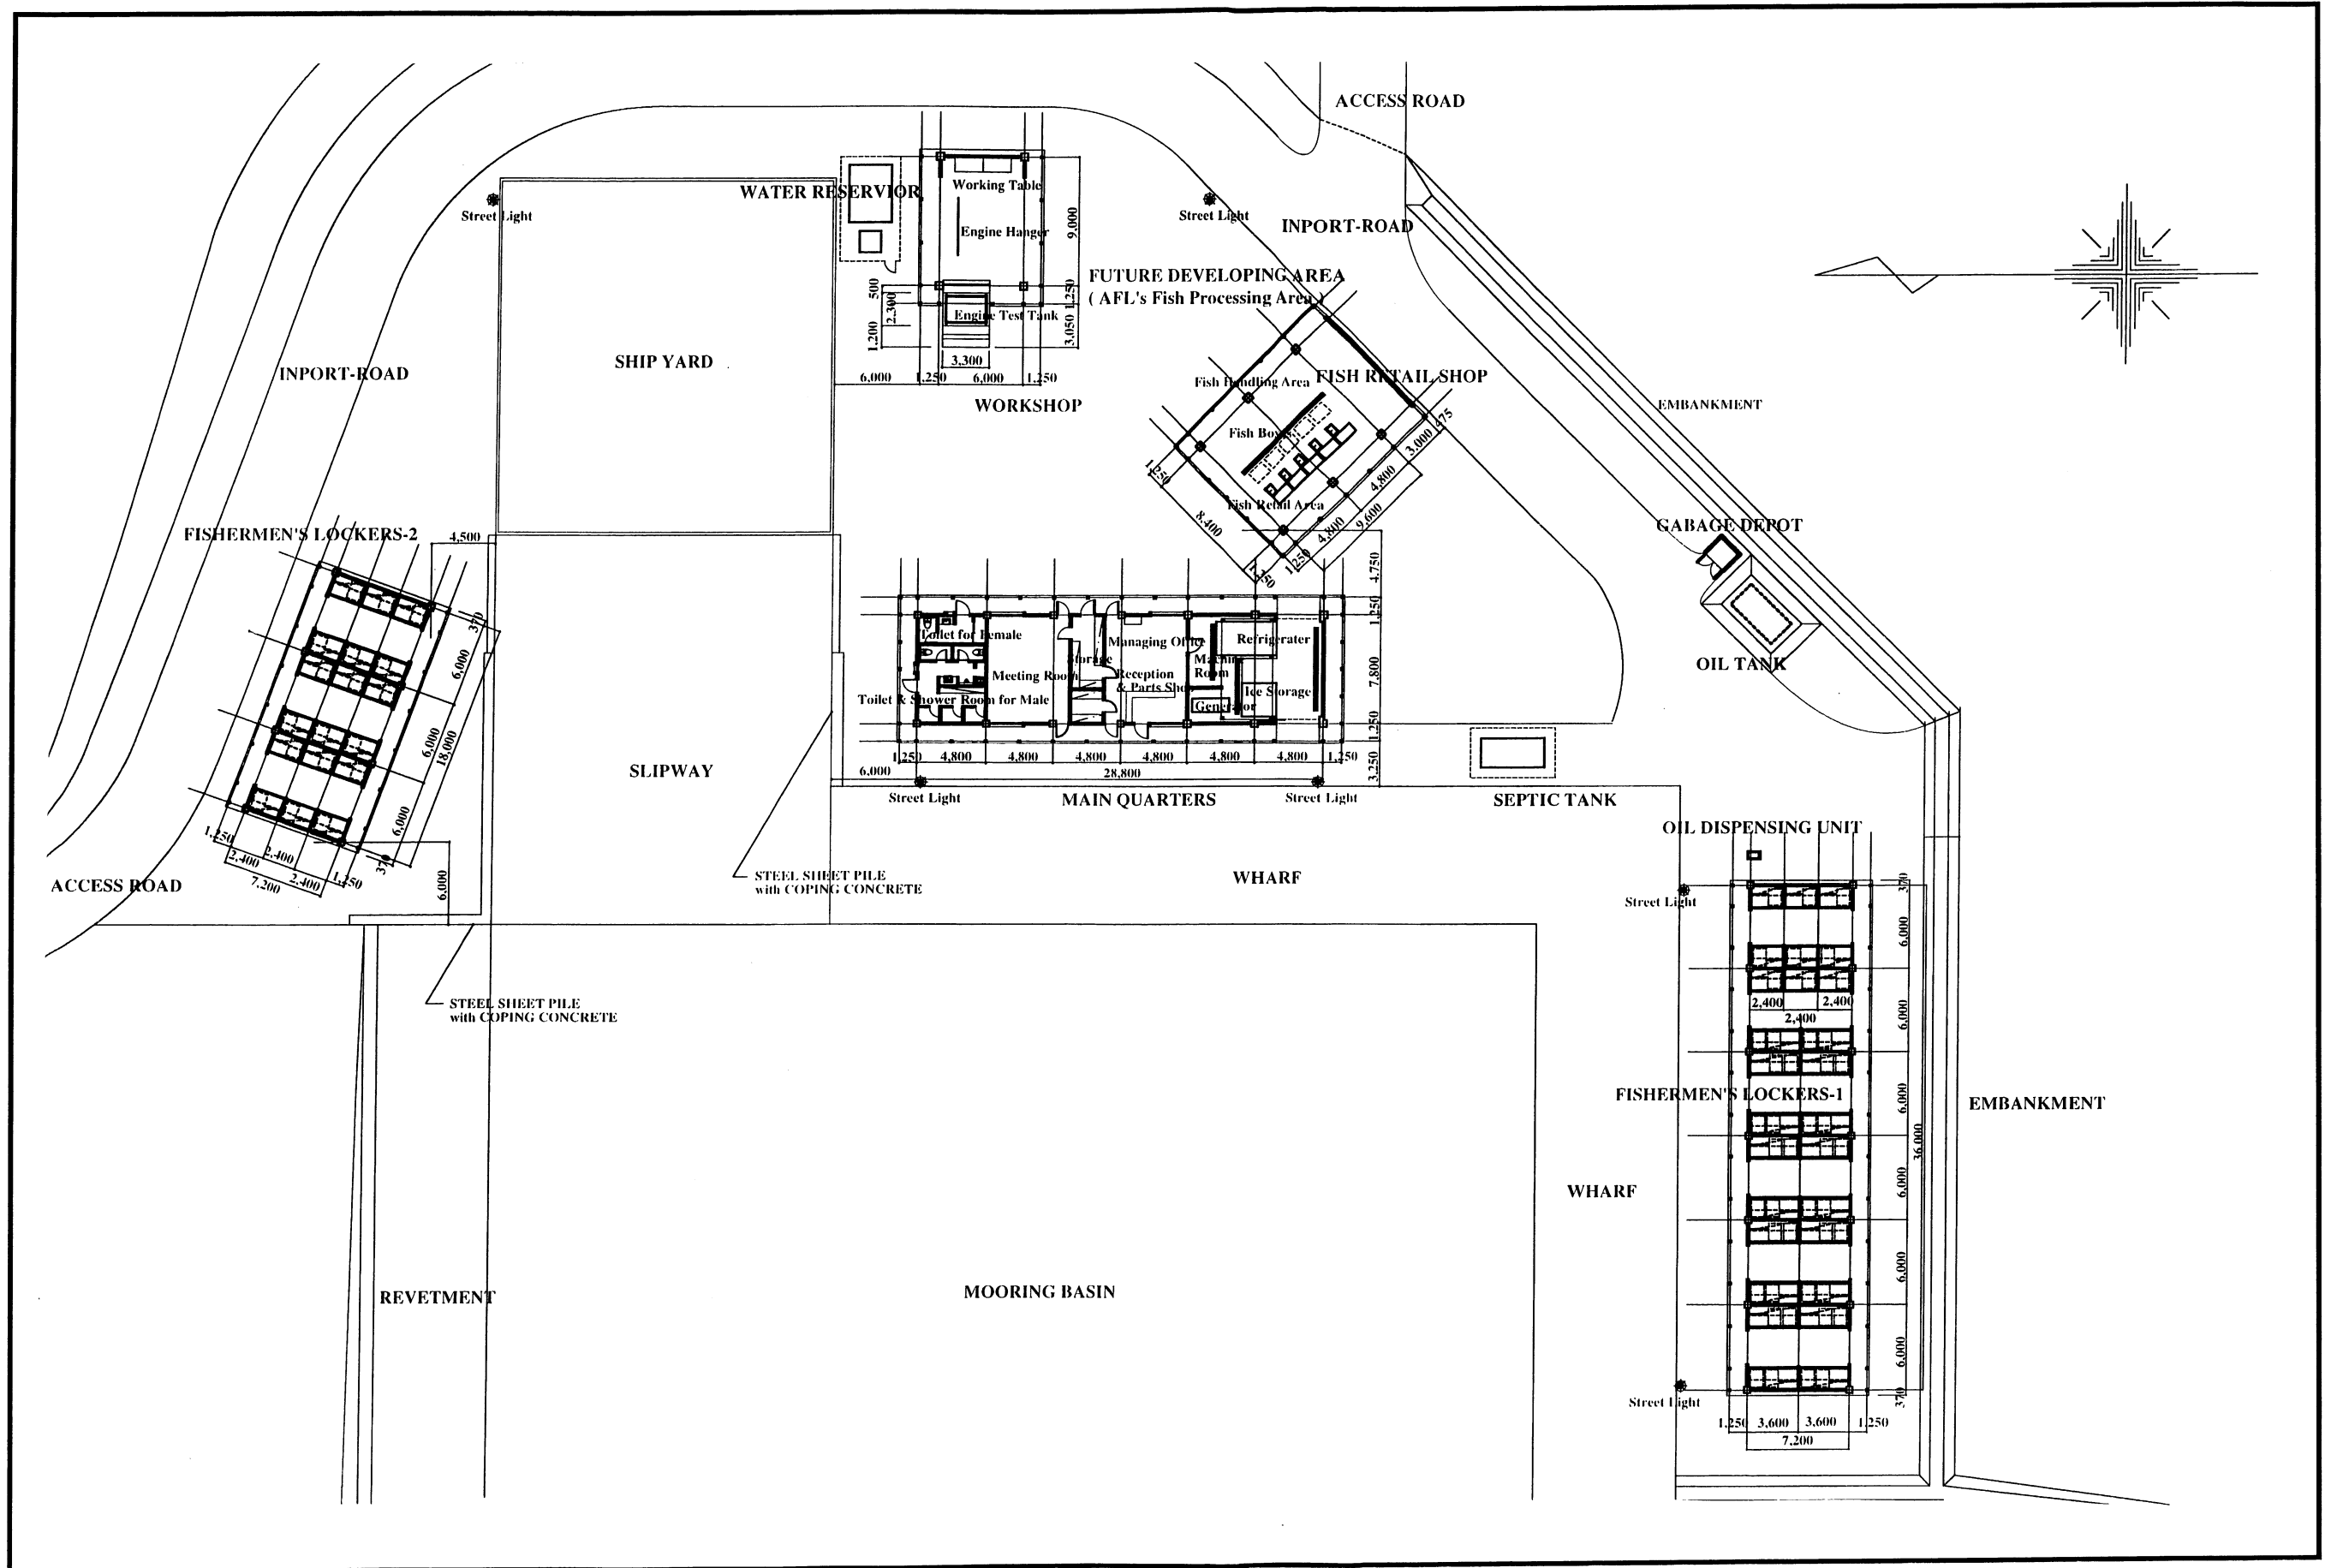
Facility Layout Plan (Urlings)
